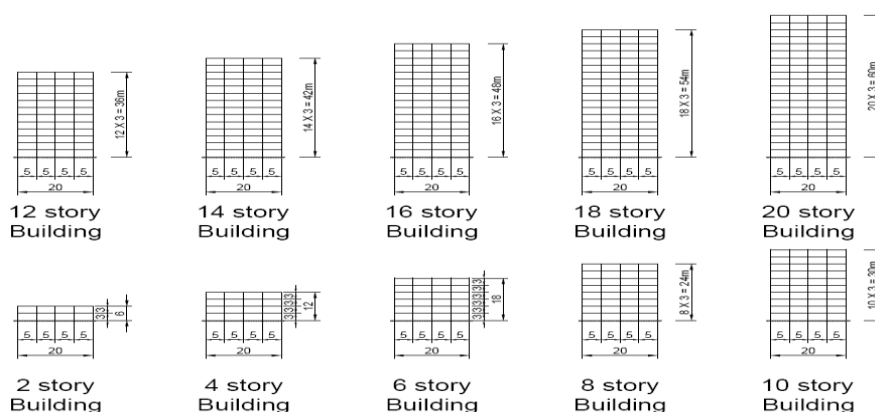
Elevation View of the Studied Moment Resisting Frame Buildings.
